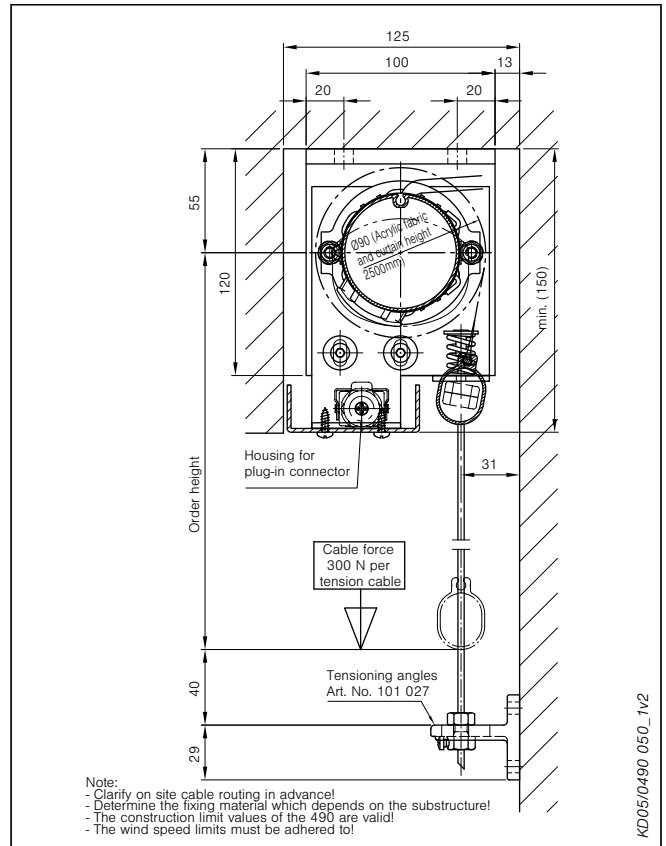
Vertical awning 491 with motor, left rolling with guide cables, ceiling mounting with inspection cover
